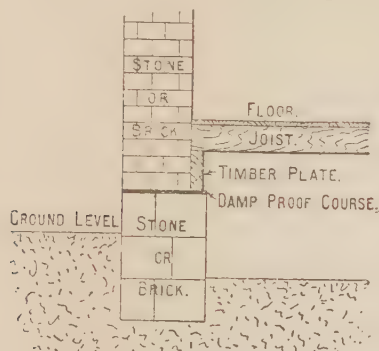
Foundation of a building in which the floor is above the level of the ground. The wall should rest on a concrete foundation.
